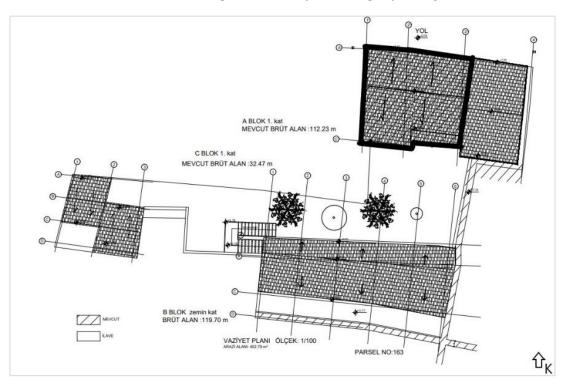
Site Plan of the Nicosia Eagle Eye Boutique Hotel [6]
